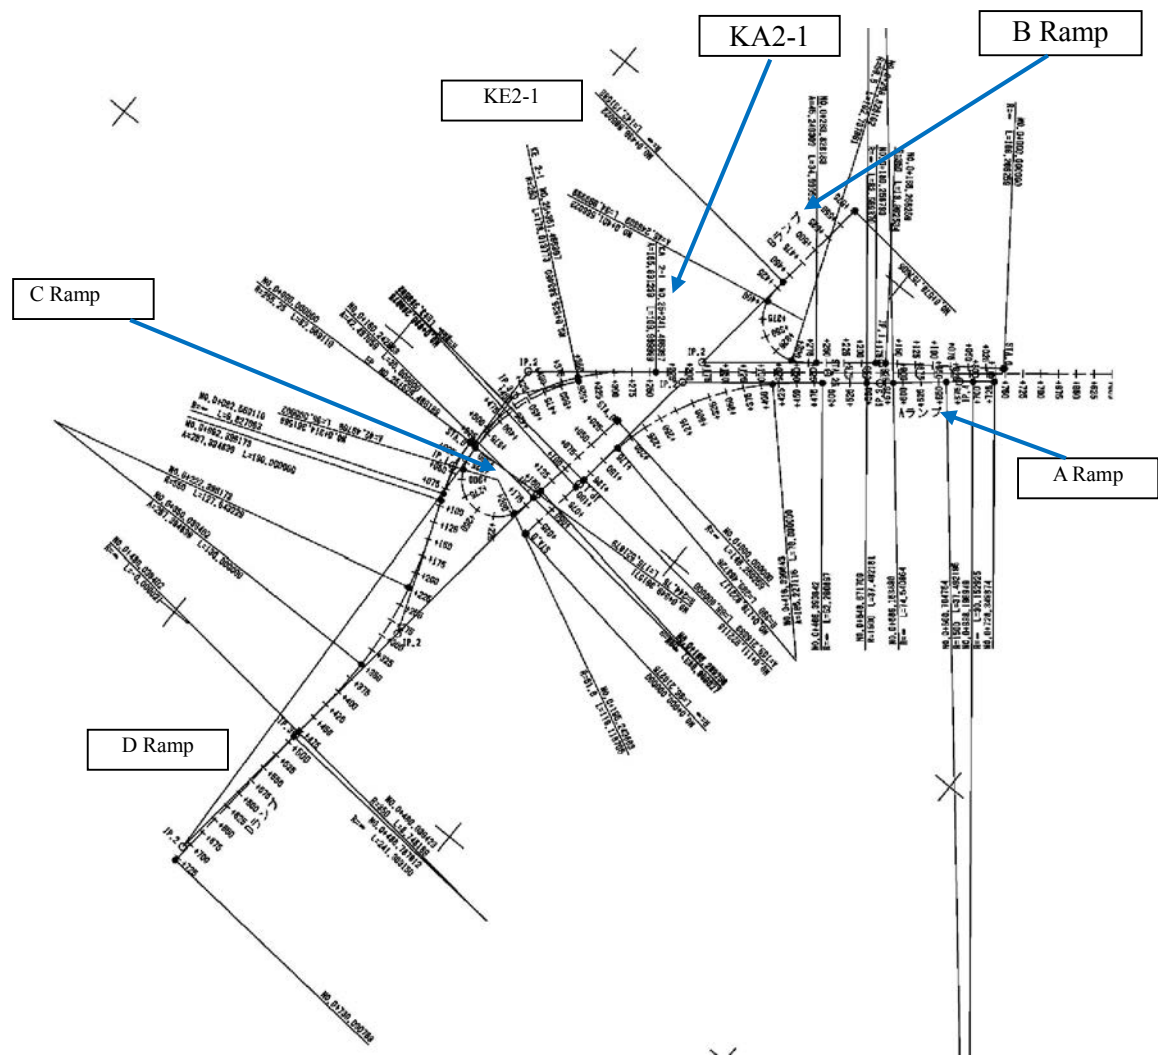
Road Horizontal Alignment Drawing (Hai Phong side)
